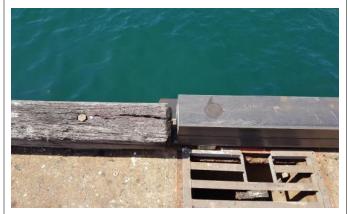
B: Wooden stringers (left) being replaced with recycled plastic stringers (right)
